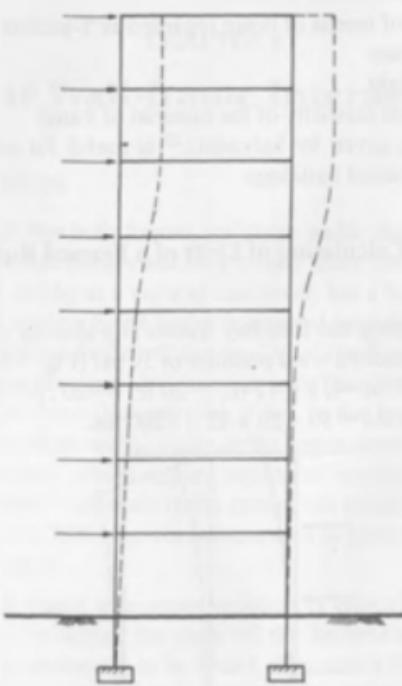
Behaviour of shear walls and frames under horizontal loads
